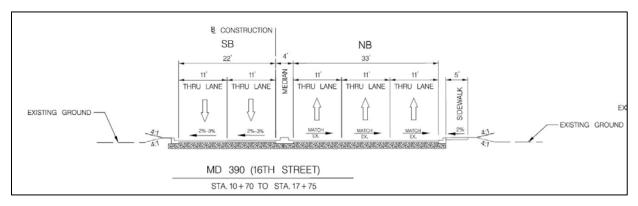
Proposed Cross Section – 16<sup>th</sup> Street between Georgia Avenue and Grace Church Road
